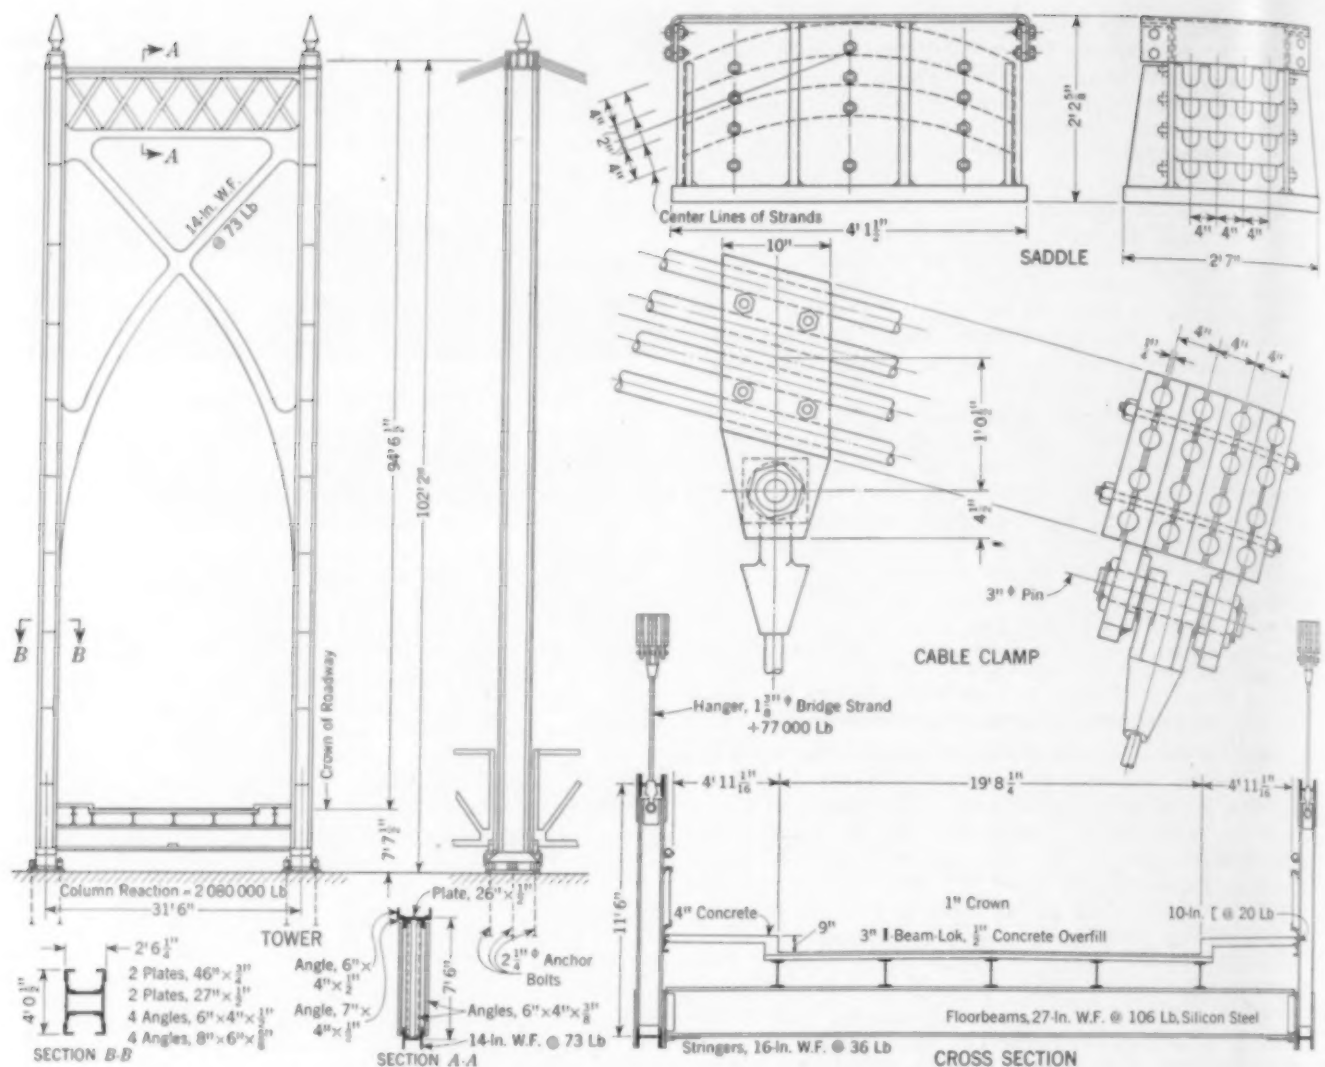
DETAILS OF STEEL SUPERSTRUCTURE, CUSCATLAN BRIDGE
